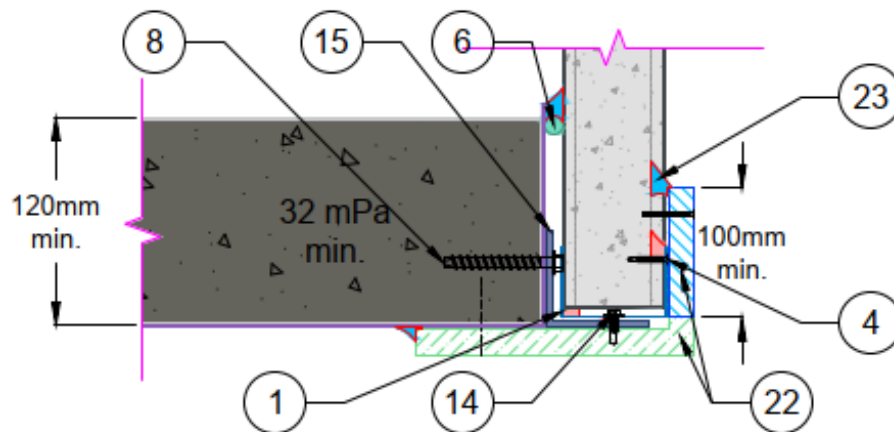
Base – vertical or horizontal wall connected to stringer via structural support (section view)
